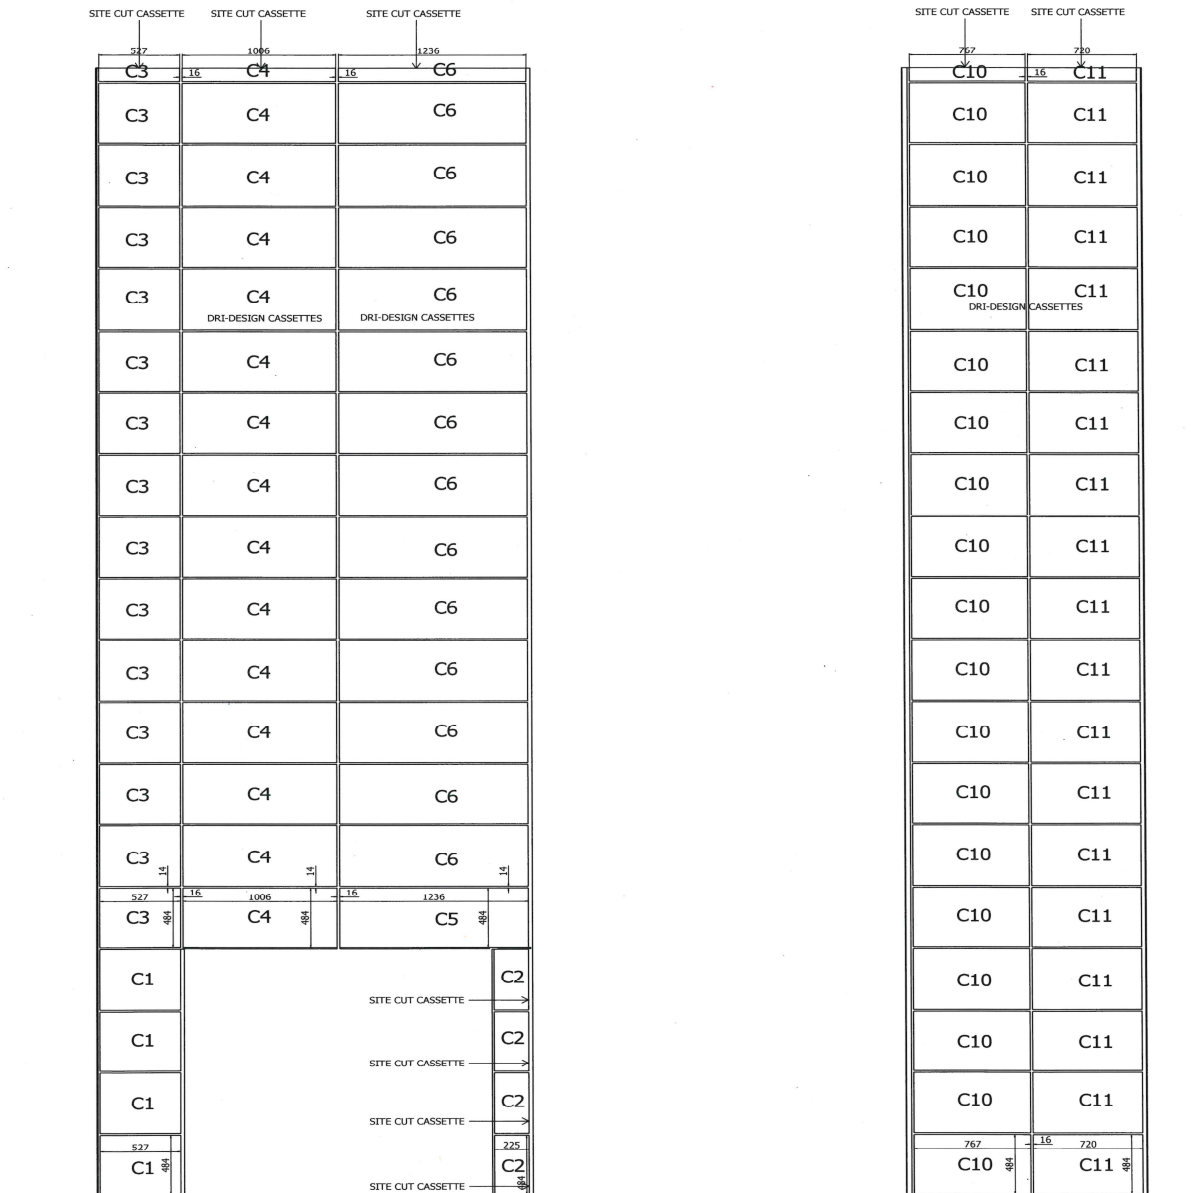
Client supplied drawing – Installation of aluminium cassette.
